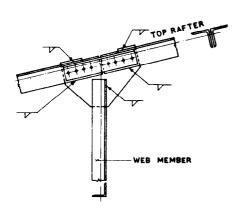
Detail Rlf at Field Splice (For 30m Span only)
